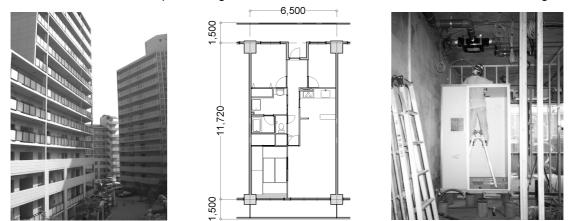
Residential Buildings, a Dwelling Unit Plan, and a Bath Unit Constructed in the Post-1980 Period
